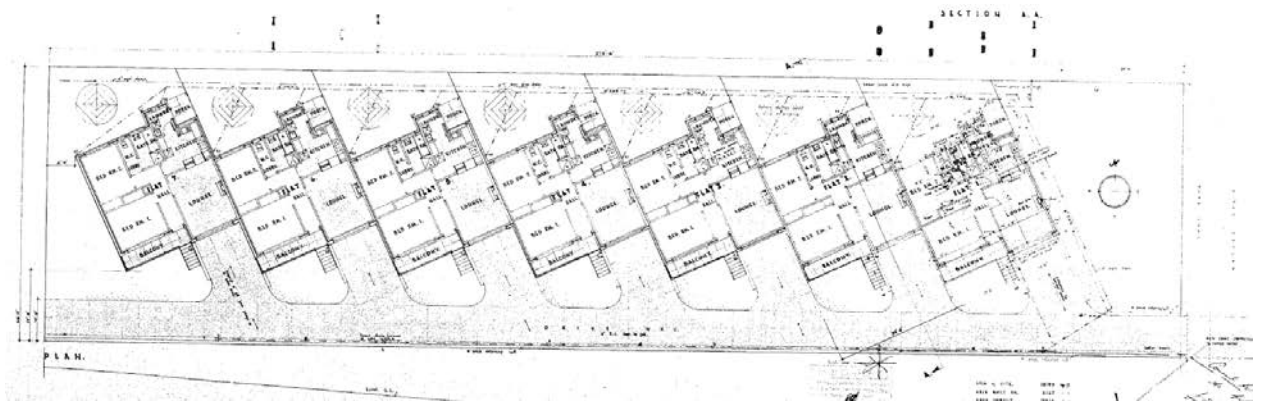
Building plans, Kylemore Flats 52 Union Road Surrey Hills.
